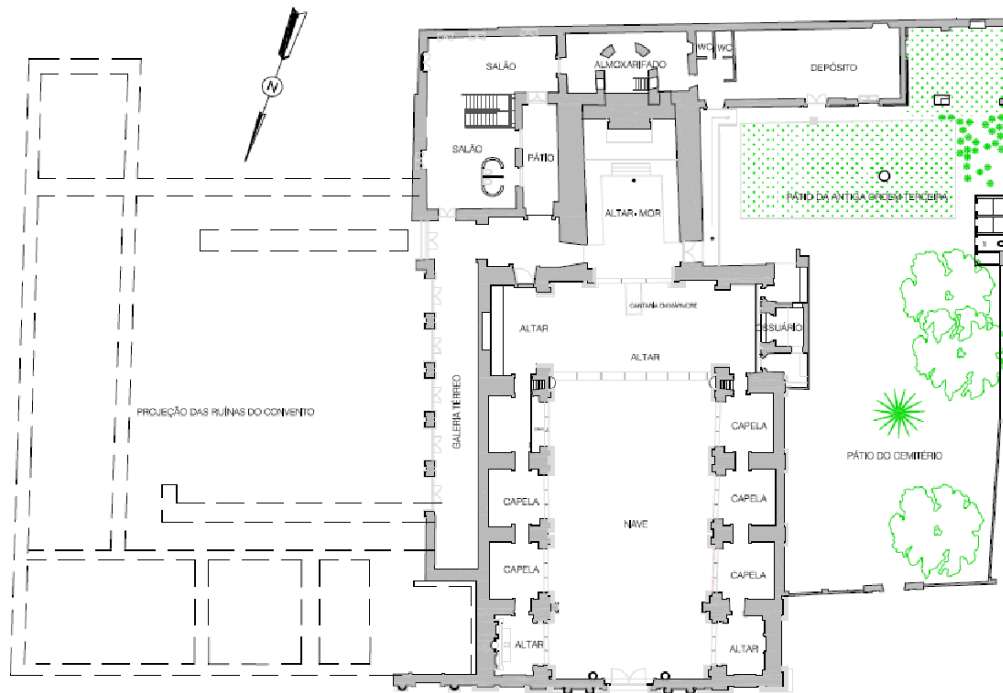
Floor plan of the ground floor of Our Lady of Carmo Church. Source: IPHAN (adapted).
